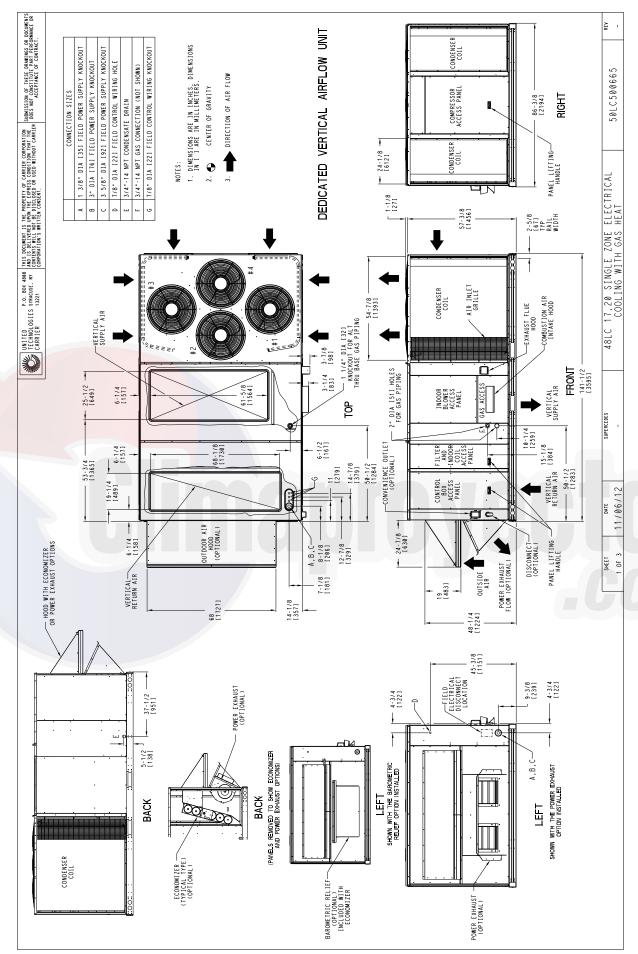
Unit Dimensional Drawing – 17 and 20 Size Units, Sheet 1 of 3
